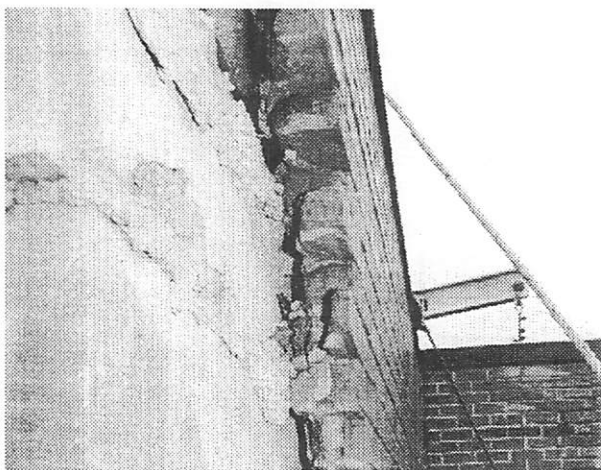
DETERIORATED BRICK CLADDING CREATES ATTACHMENT PROBLEMS FOR NEW CLADDING MATERIAL. NOTE: UP TO 2/3 OF THE THICKNESS OF BRICK HAD SPALLED INTO THE CAVITY.
